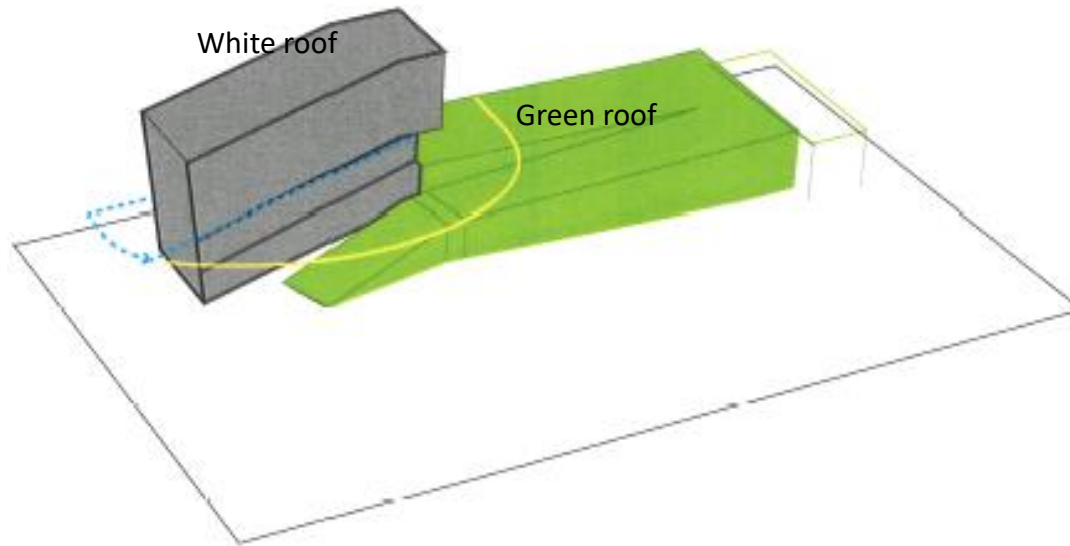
White roof and green roof defined for CoE building (Augustine, 2011).
